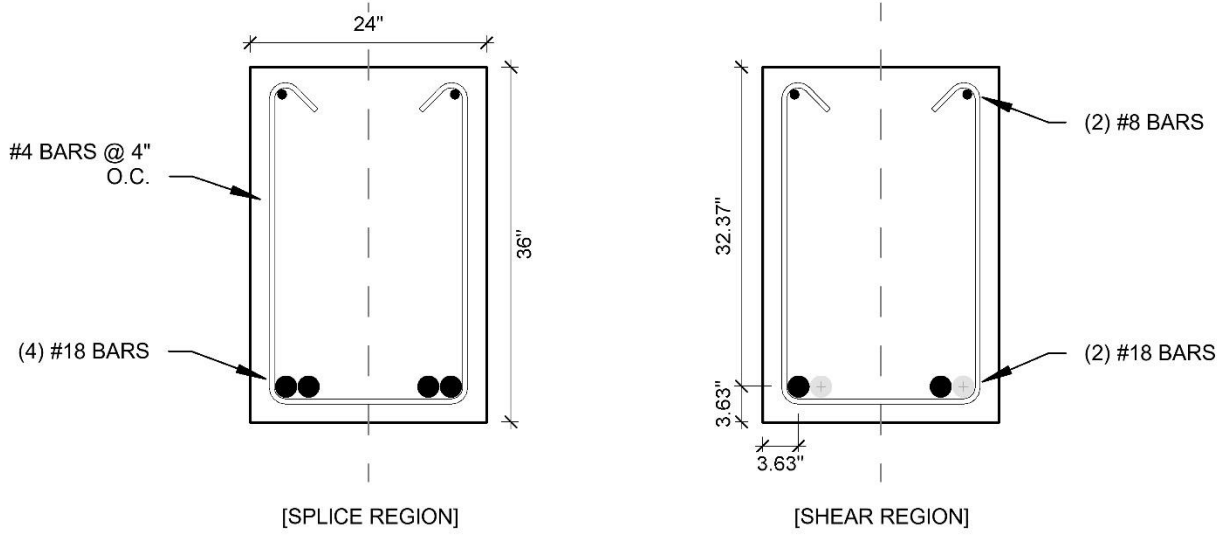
Cross section of 18-b (1 in. = 25.4 mm)
